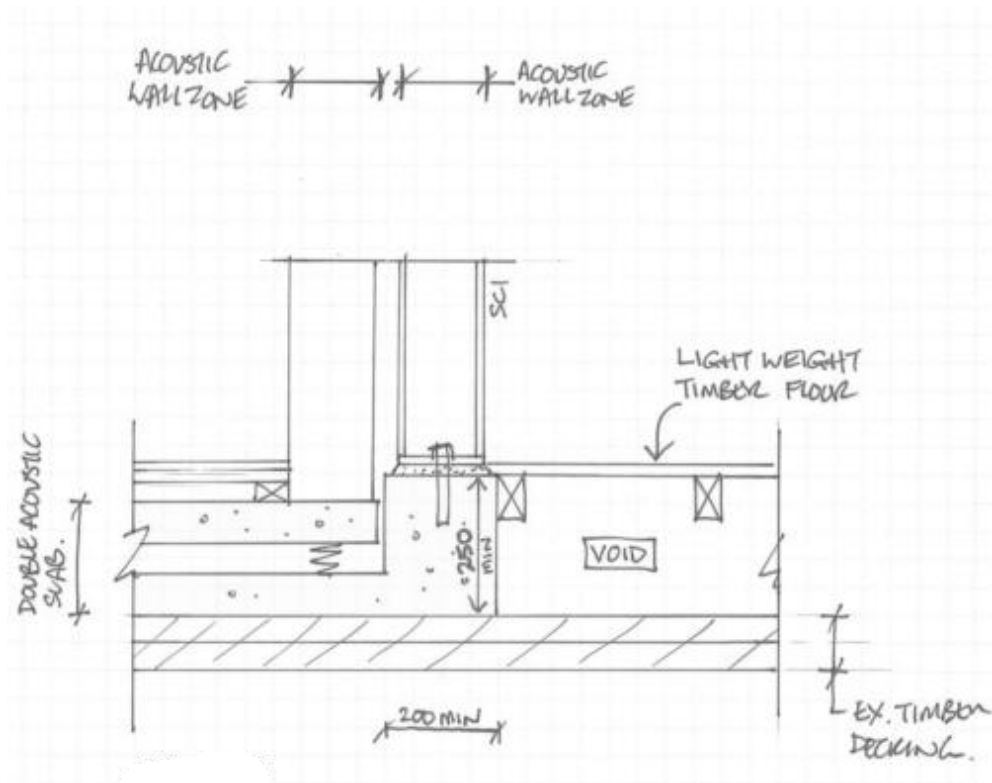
Typical detail of acoustic wall and floor connection. Sketch provided by TTW.
